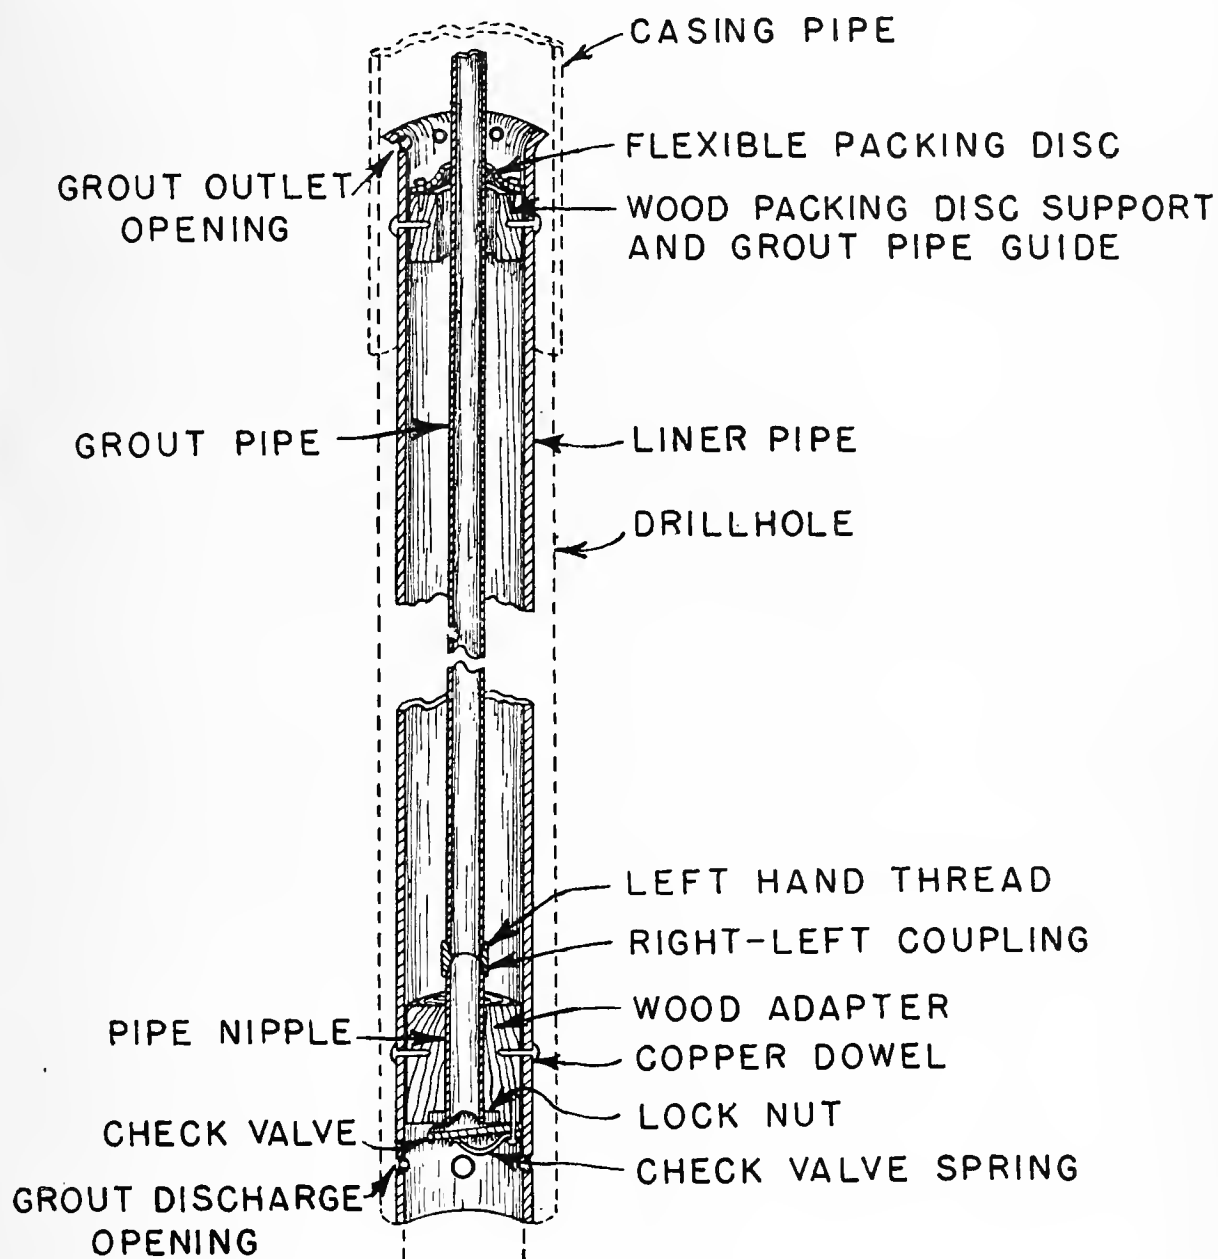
Detail Showing Arrangement of Grout and Liner Pipe.
